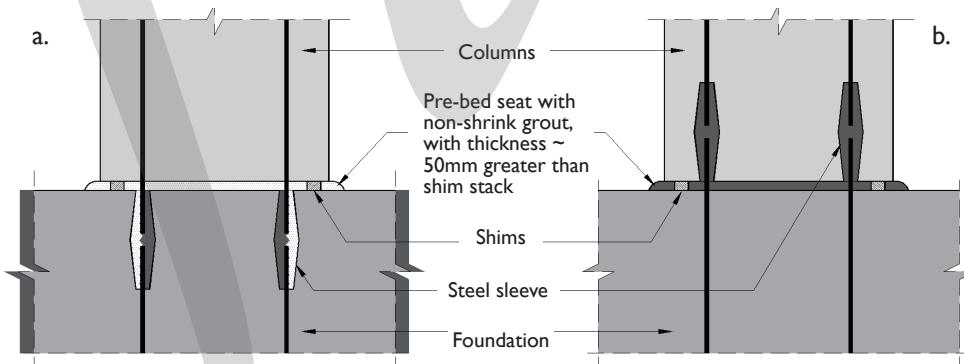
Column-to-foundation connections with steel splice sleeves
